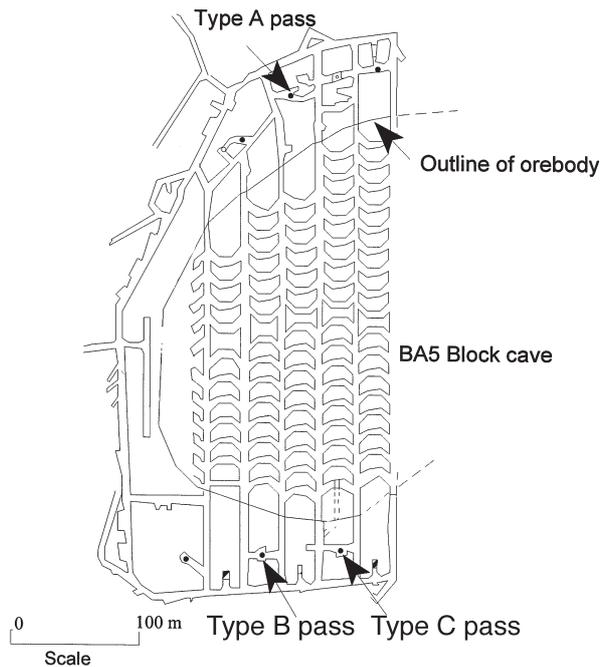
Plan showing layout of BA5 Block Cave and position of passes
